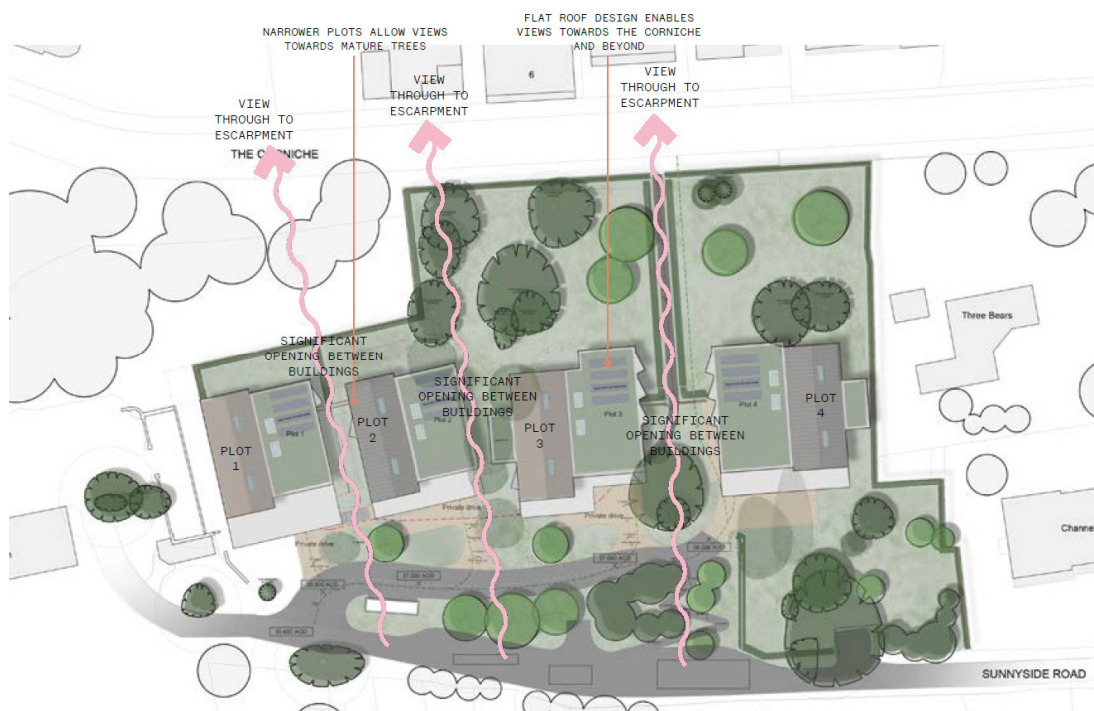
DAS extract demonstrating the proposed green spaces and views (Hollaway)
